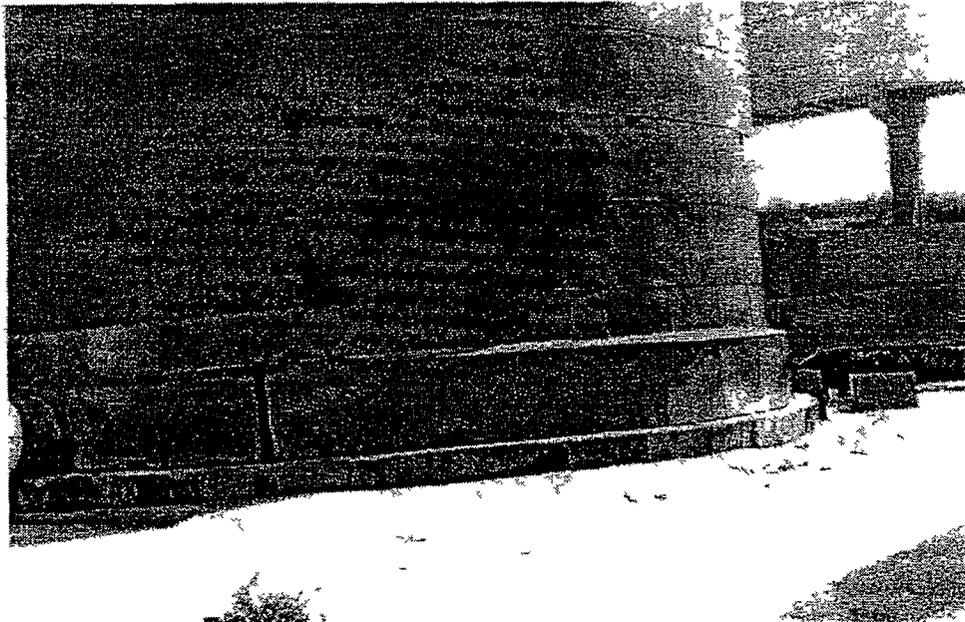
S.U. of Demineralized Water Tank/DWT/ at elevation +0.00m, Unit 3 Anchorage Ring
